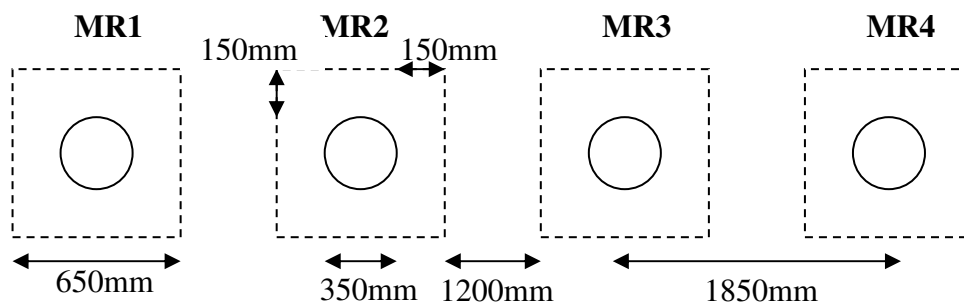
A schematic diagram of the order of piles and excavation geometries
